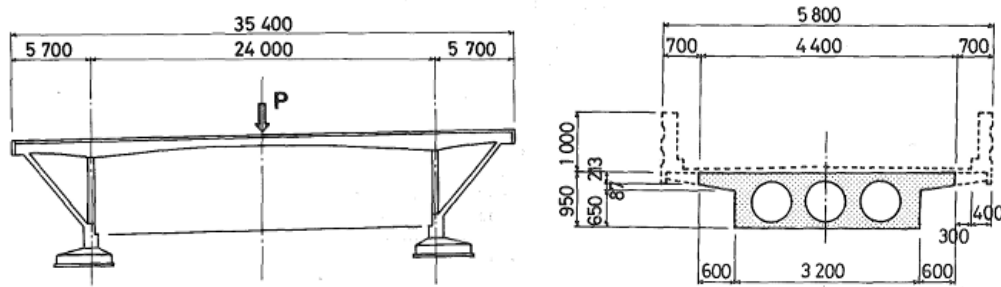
Prestressed concrete test bridge (Kato and Shimada, 1986).
